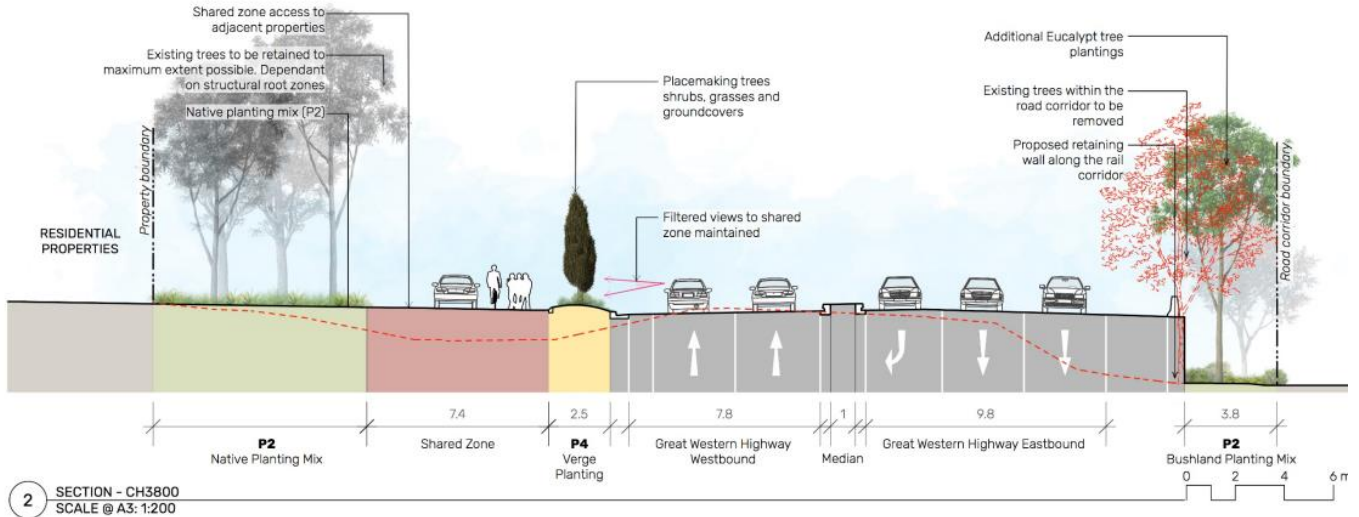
Typical cross section within the southern portion of proposal – north of Bellevue Crescent showing shared zone and right hand turn lane. (REF p. 46)
